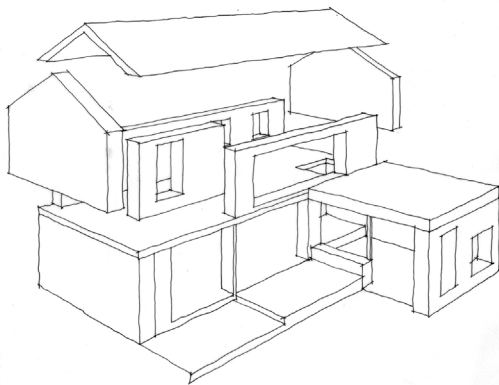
The cross laminated timber panels can be erected in large monolithic pieces of mono-material and can be used as walls, floors and roof structures
